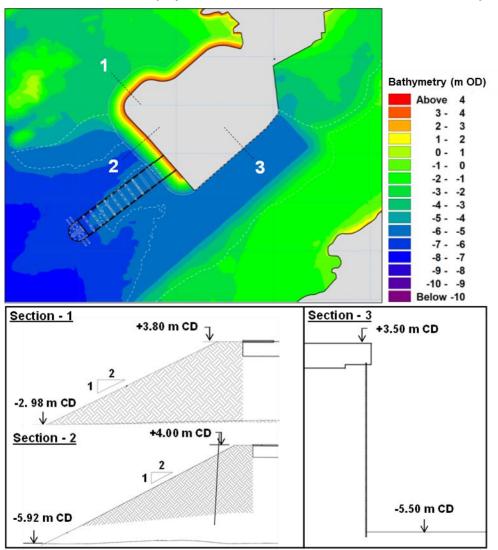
Cross-section of the quay wall and revetment defence around the development area
